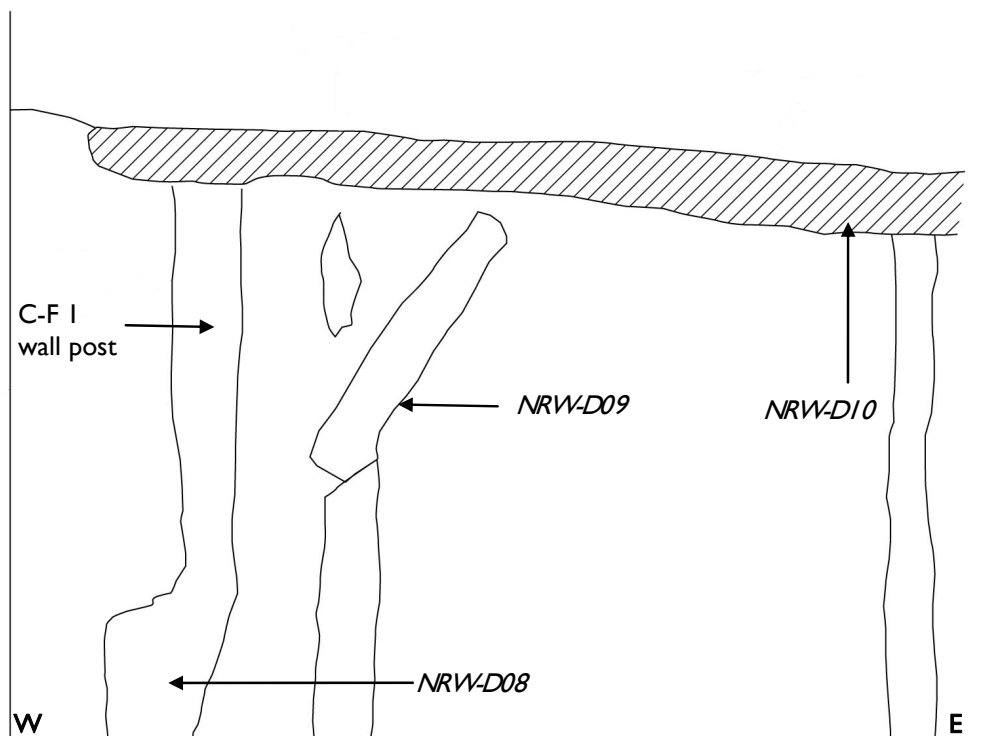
Internal elevation of part of the north wall in bay 1, showing the location of the samples taken at first-floor level
